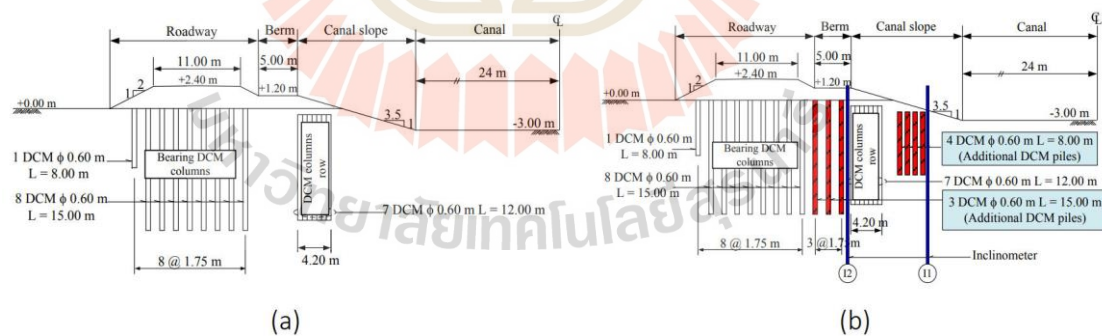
Canal and roadway cross-section with DCM column configuration. (a) Initial DCM column configuration, (b) Remedial DCM column configuration.
